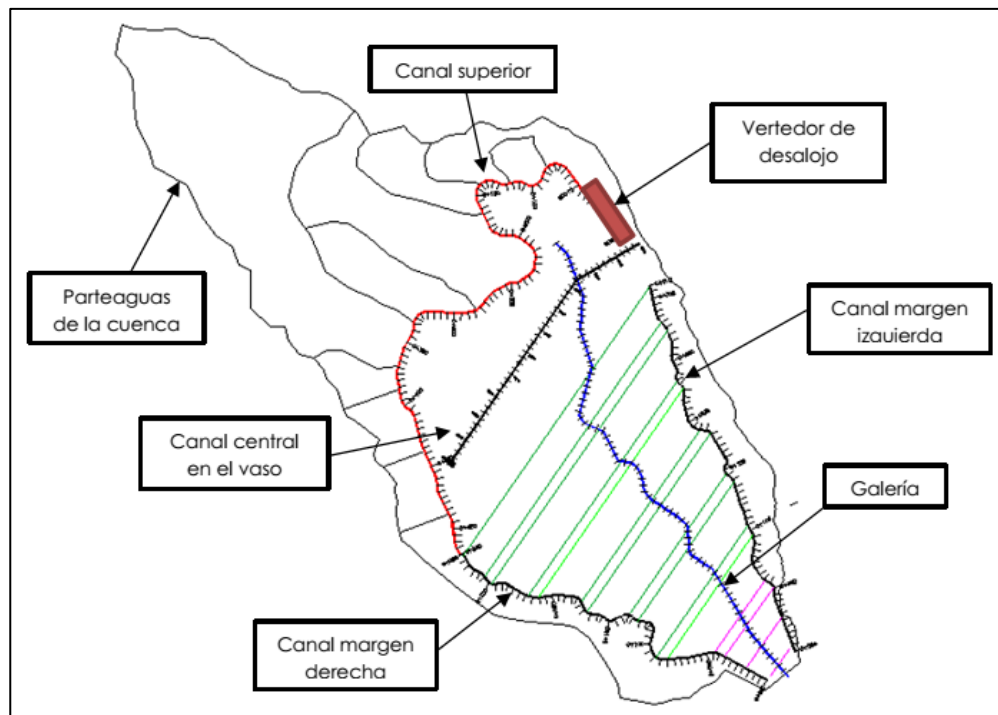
Location of the hydraulic protection structures for the La Fortuna Project tailings disposal site
